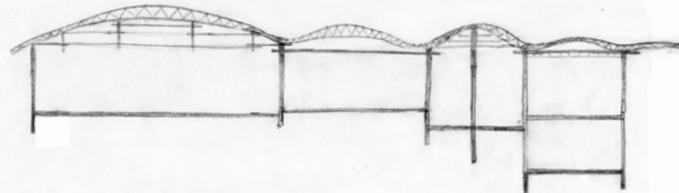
Light steel space frame roof takes a curvaceous form, while a rigid concrete frame below expresses qualities of Pacific architecture.
